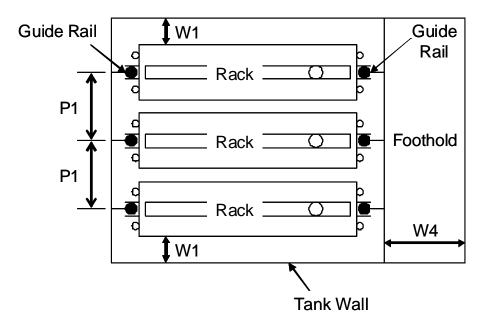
Rack Layout in Membrane Submerged Tank (top view)
